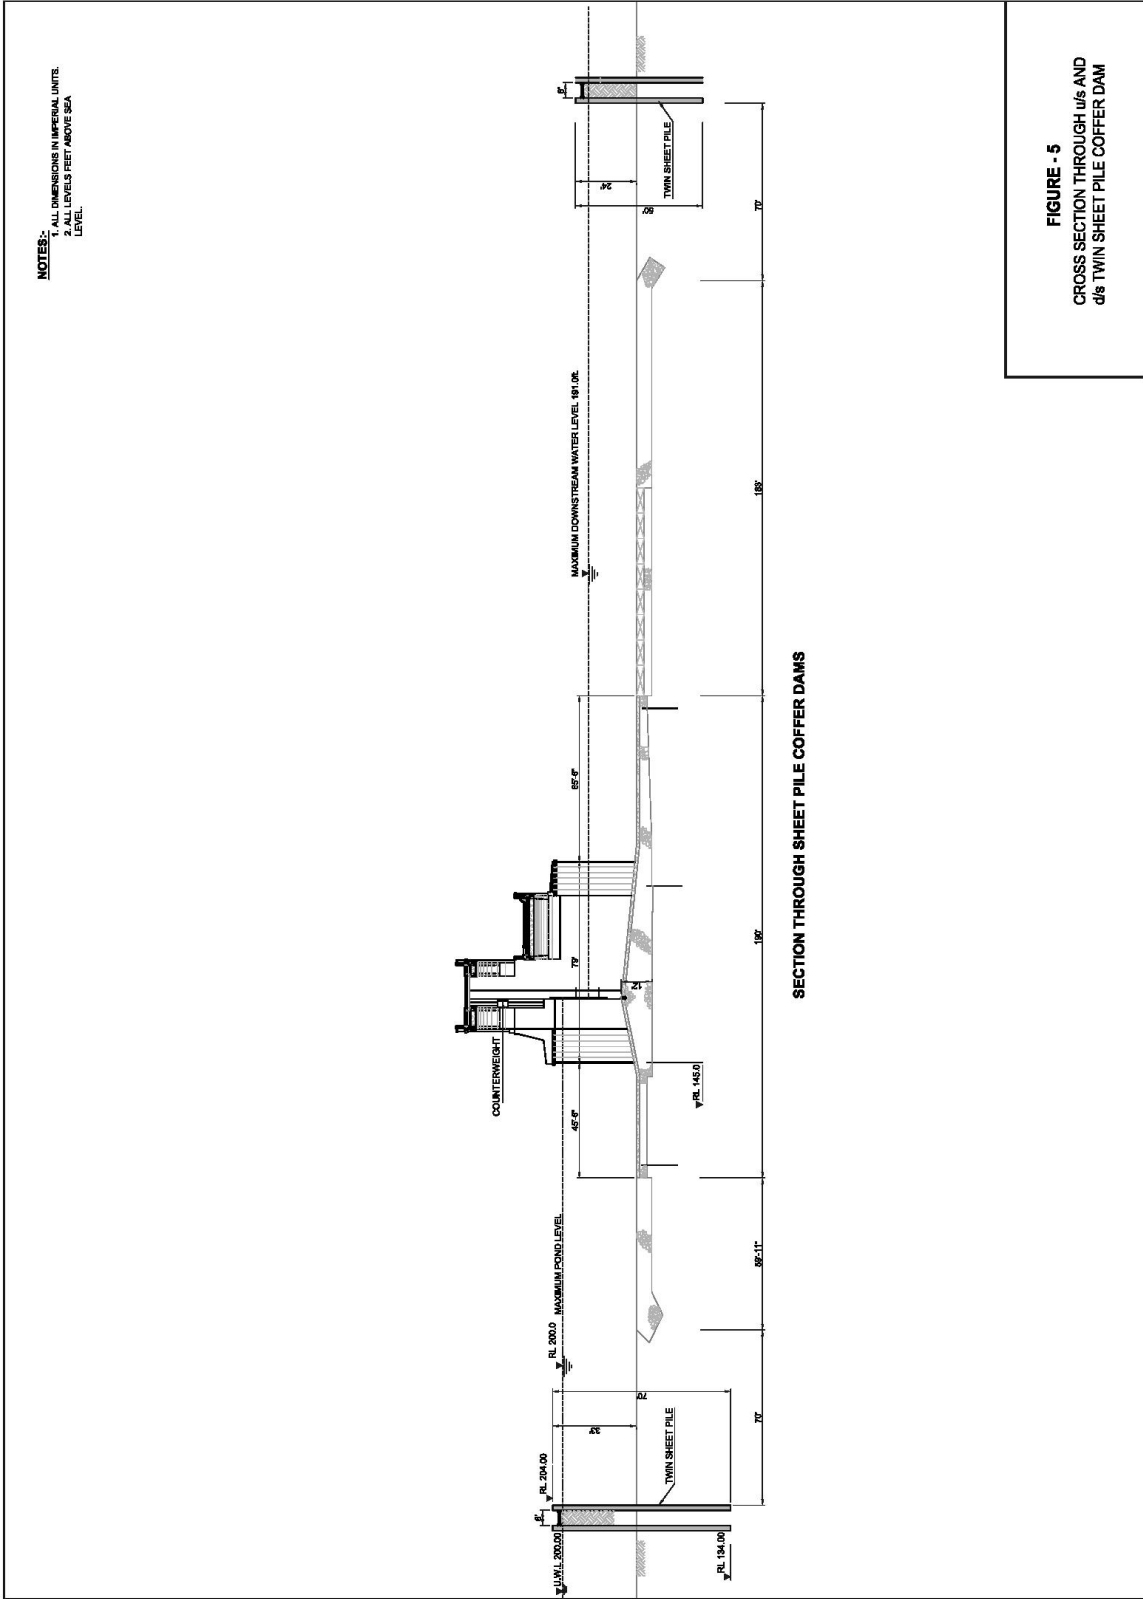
Cross-section of Sheet Pile Cofferdam
